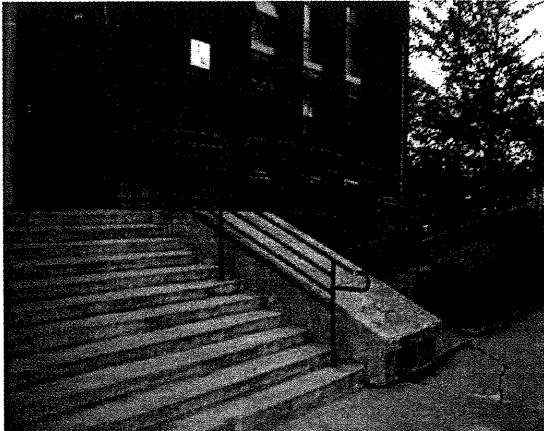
Main Entry stairs & wheelchair ramp (east elevation)
